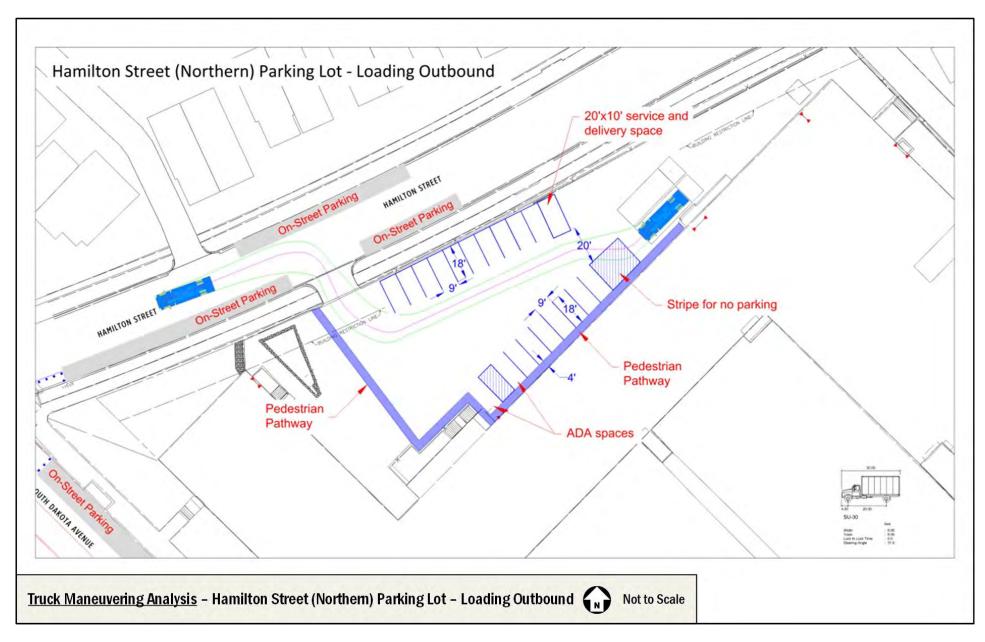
Hamilton Street (Northern) Parking Lot – Loading Outbound
